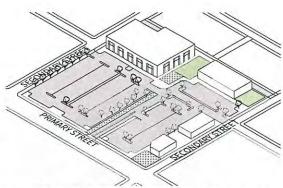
Existing Commercial Center - Most site area of this existing commercial center is covered by parking. Some buildings are located towards the street and some others have small open spaces for outdoor seating.
